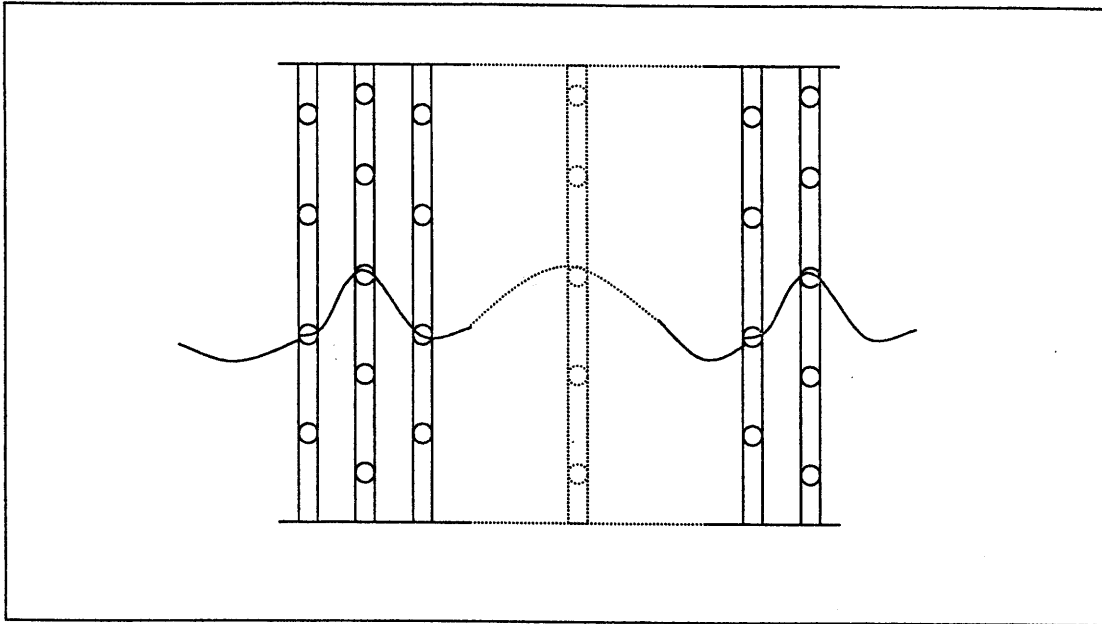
Placement of Electric Wiring through the Interior Framing Studs
